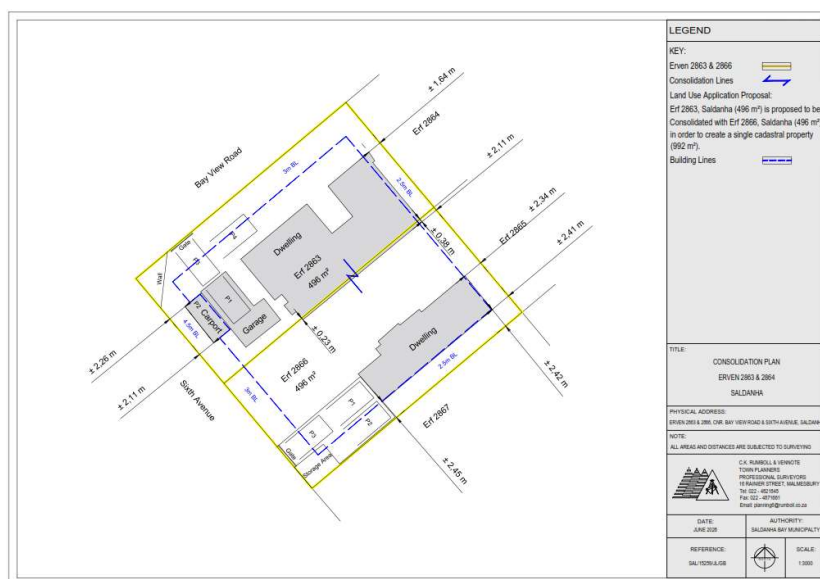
Proposed Consolidation Plan of Erven 2863 and 2866, Saldanha
